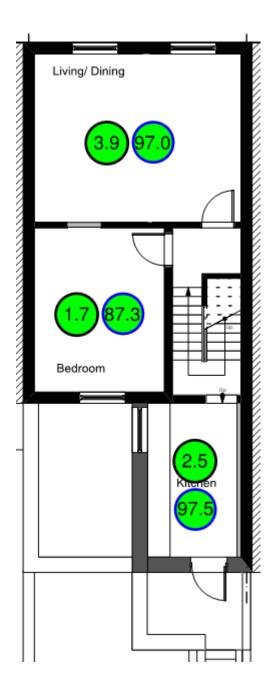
ADFs and No-Sky line of Proposed First Floor Level
